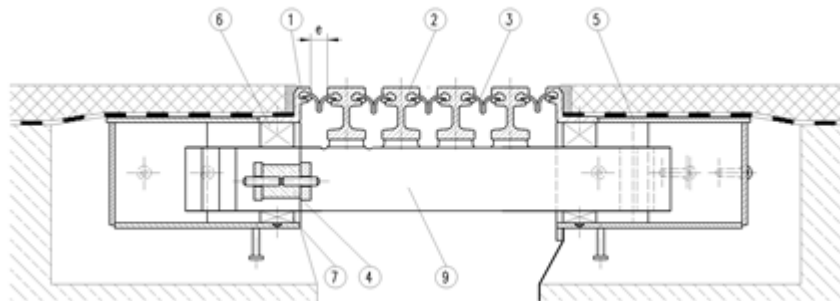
Cross section at carriageway with crossbeam of multiple crossbeam modular expansion joint with compression control elements
